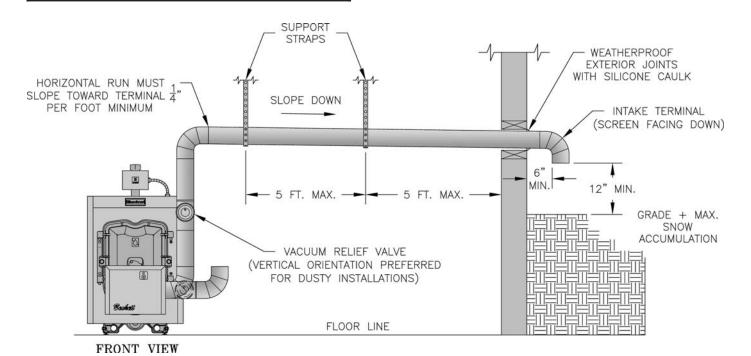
Optional Air Intake Piping Installation - Only Available with Beckett Burner
